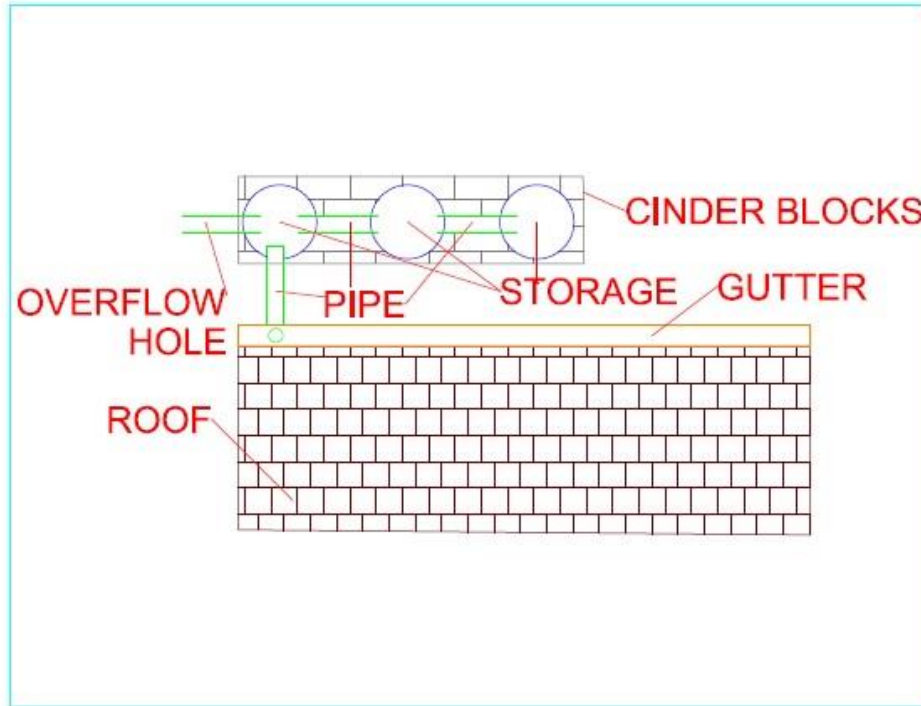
A CAD drawing of the aerial view of the system created by the RainBeaus on 11/17/14
